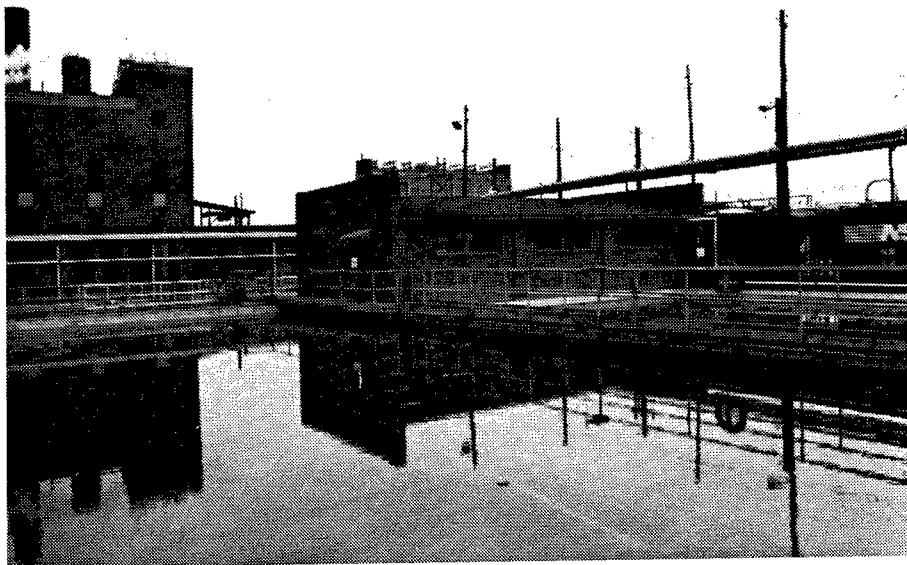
Building A9: Water Filtration Facility, Lime Building.
